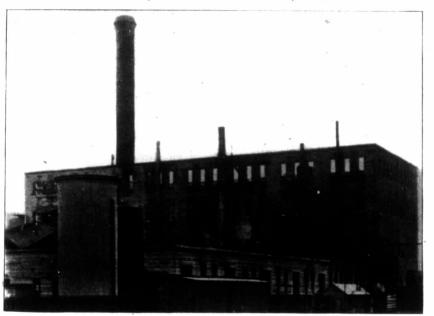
Concrete Steel Factory Building of the Pacific Coast Borax Company after the Fire
